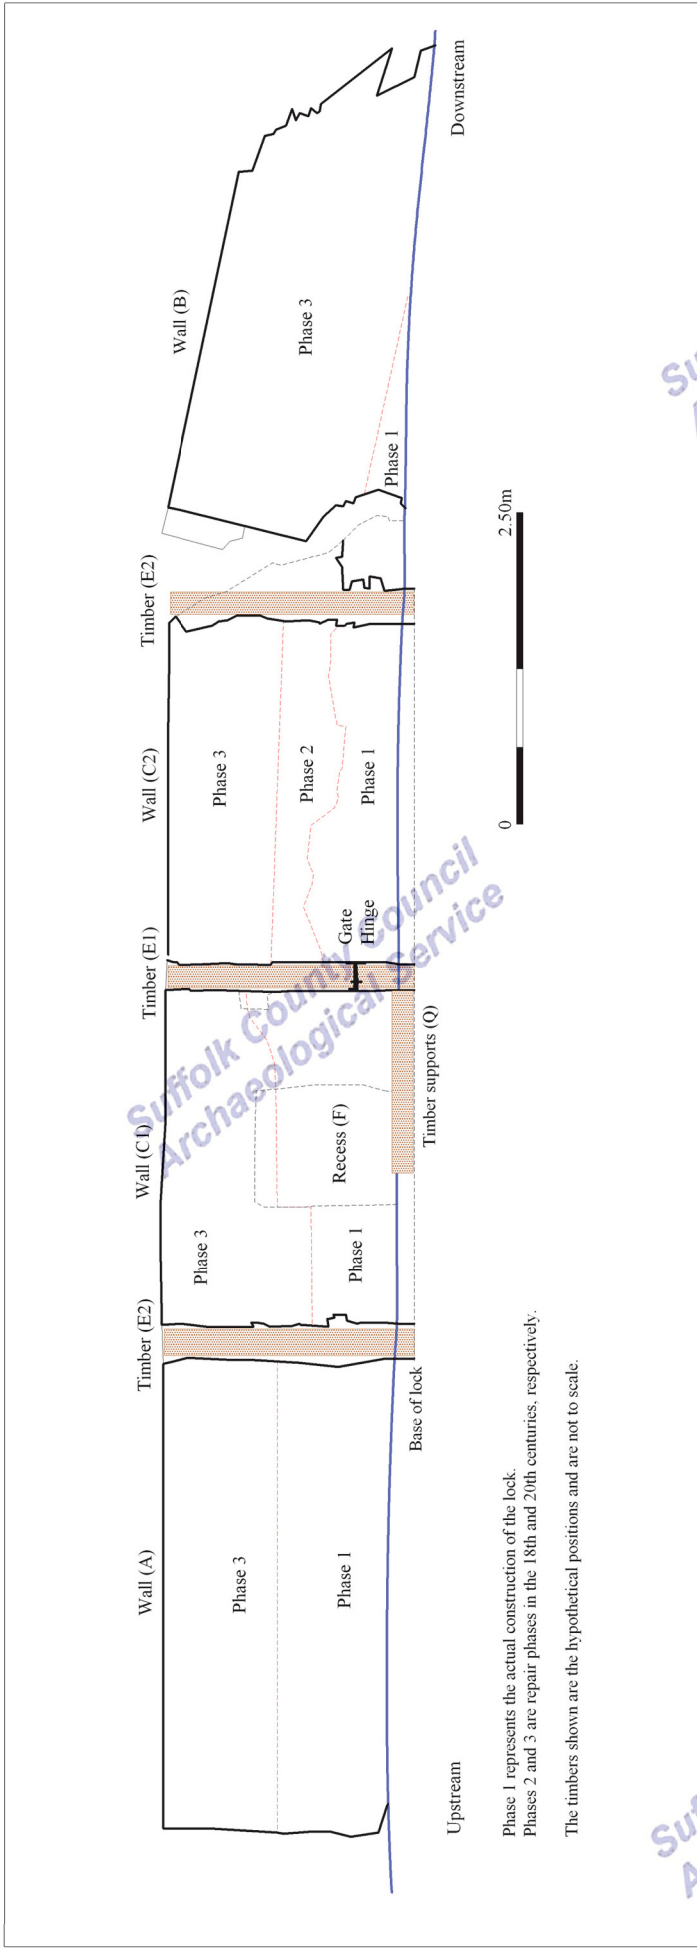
Elevation of Cavenham Lock, Southern structure, West side phasing
